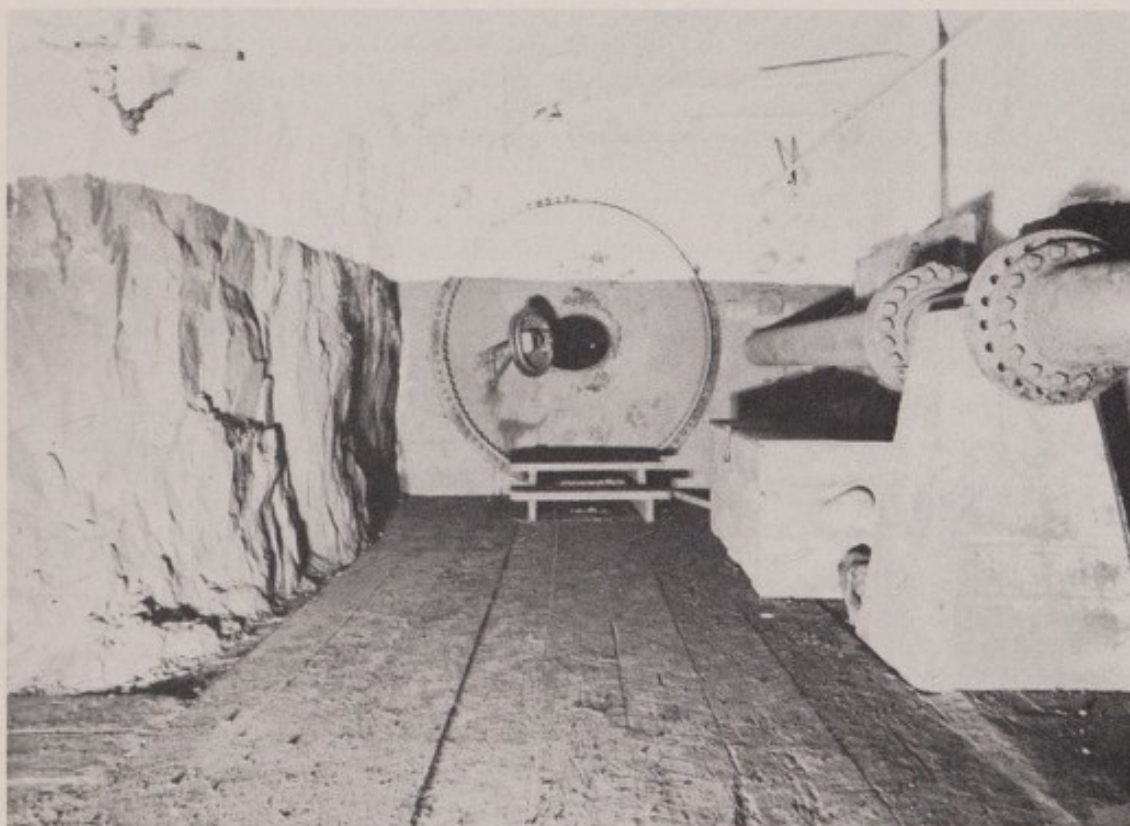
Emergency Bulkhead to Sealed Pumproom.
